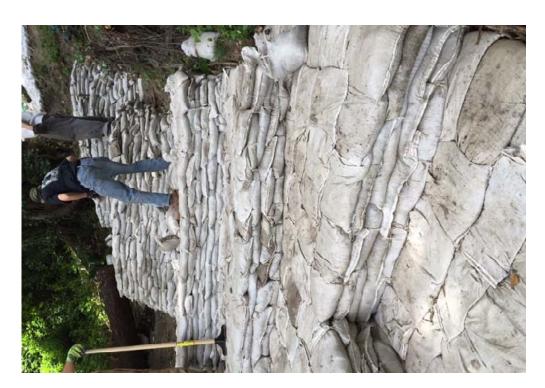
Construction of upper sandbag walls (Jun 2 2016).
